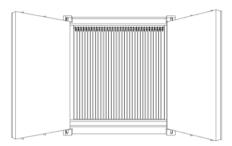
Containers walls, doors, floor and roof will be insulated with polystyrene foam and a polyurethane foam.
